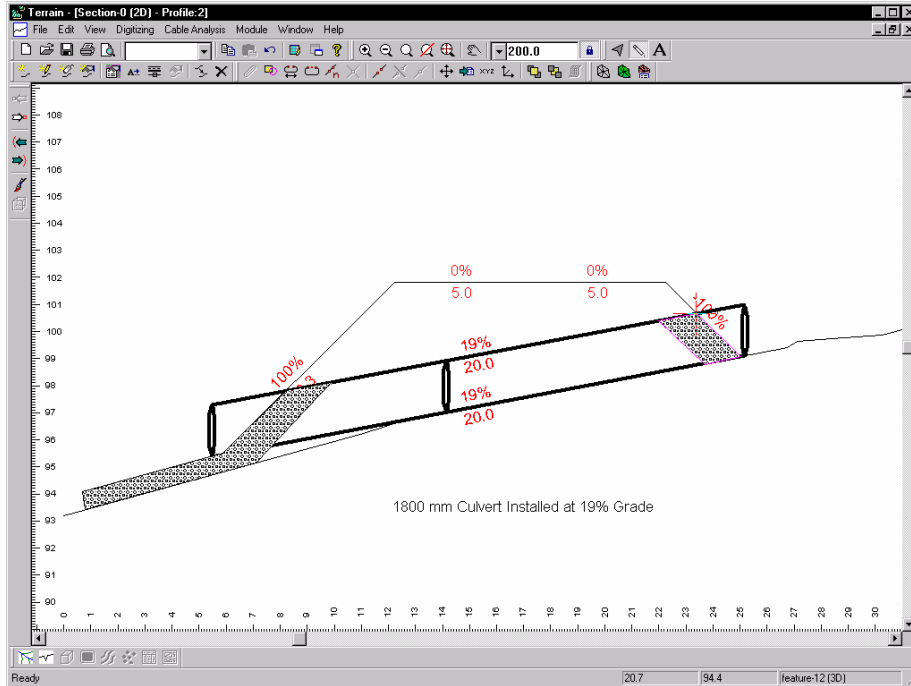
Culvert Cross Section with Annotation and Hatching
